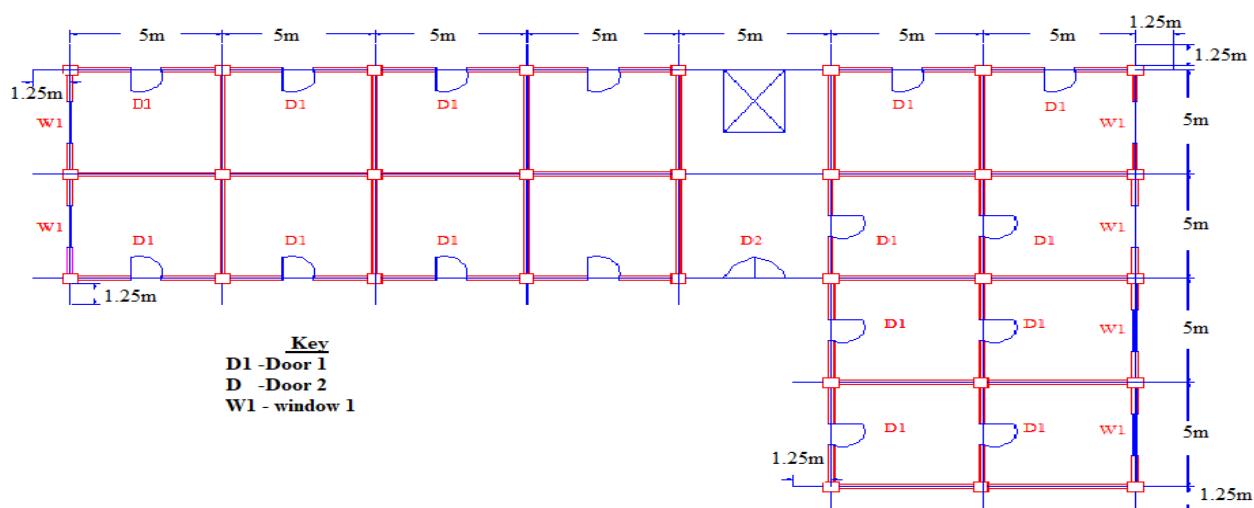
3 Floor plan of (G+7) and (G+10) irregular plan building models
